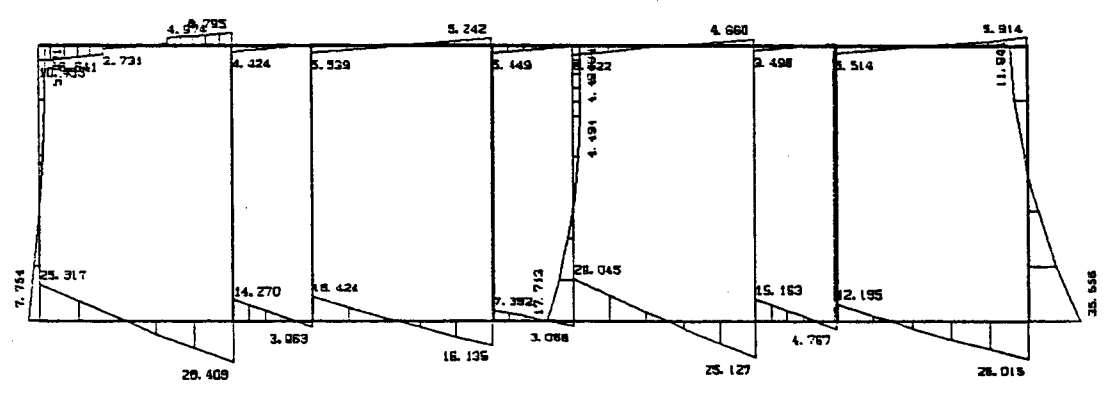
Load and Sectional Force of Box Culvert Section (Case 2)
